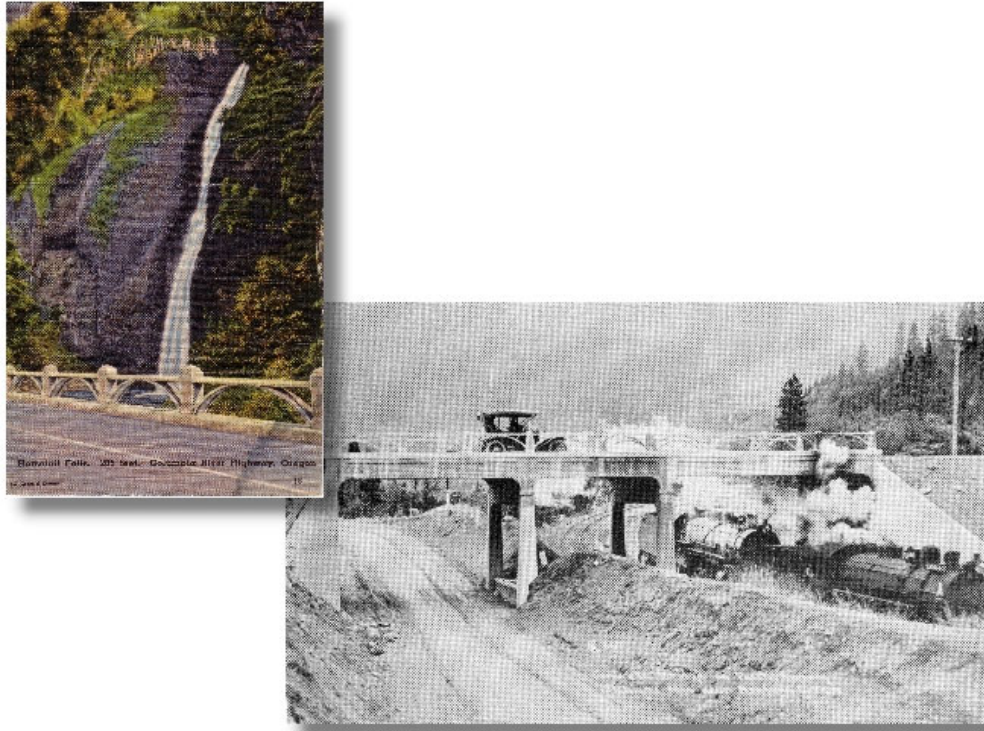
Horsetail Falls Bridge (left) and Steinman Overcrossing (right)
